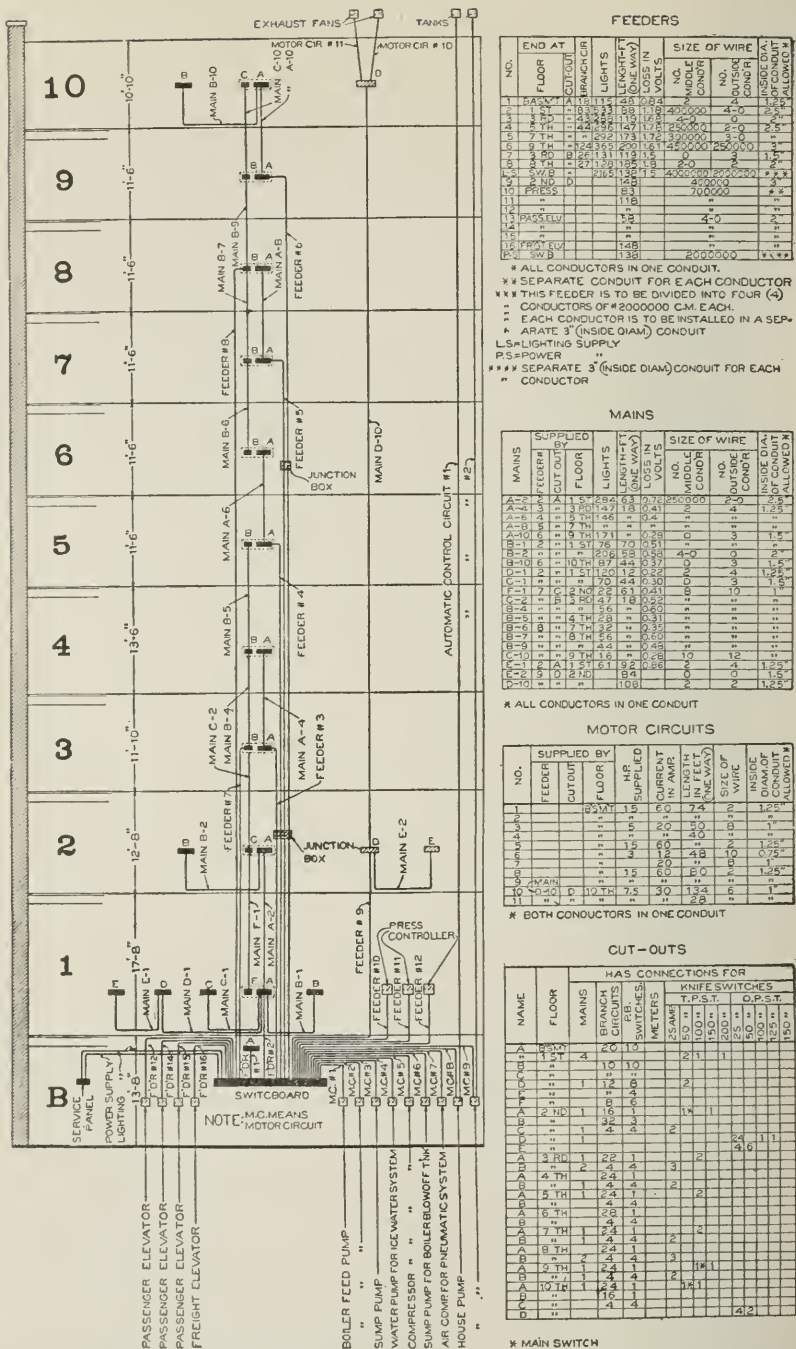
Wiring of an Office Building. Diagram Showing Arrangement of Feeders and Mains Cut-Out Centers, etc.
